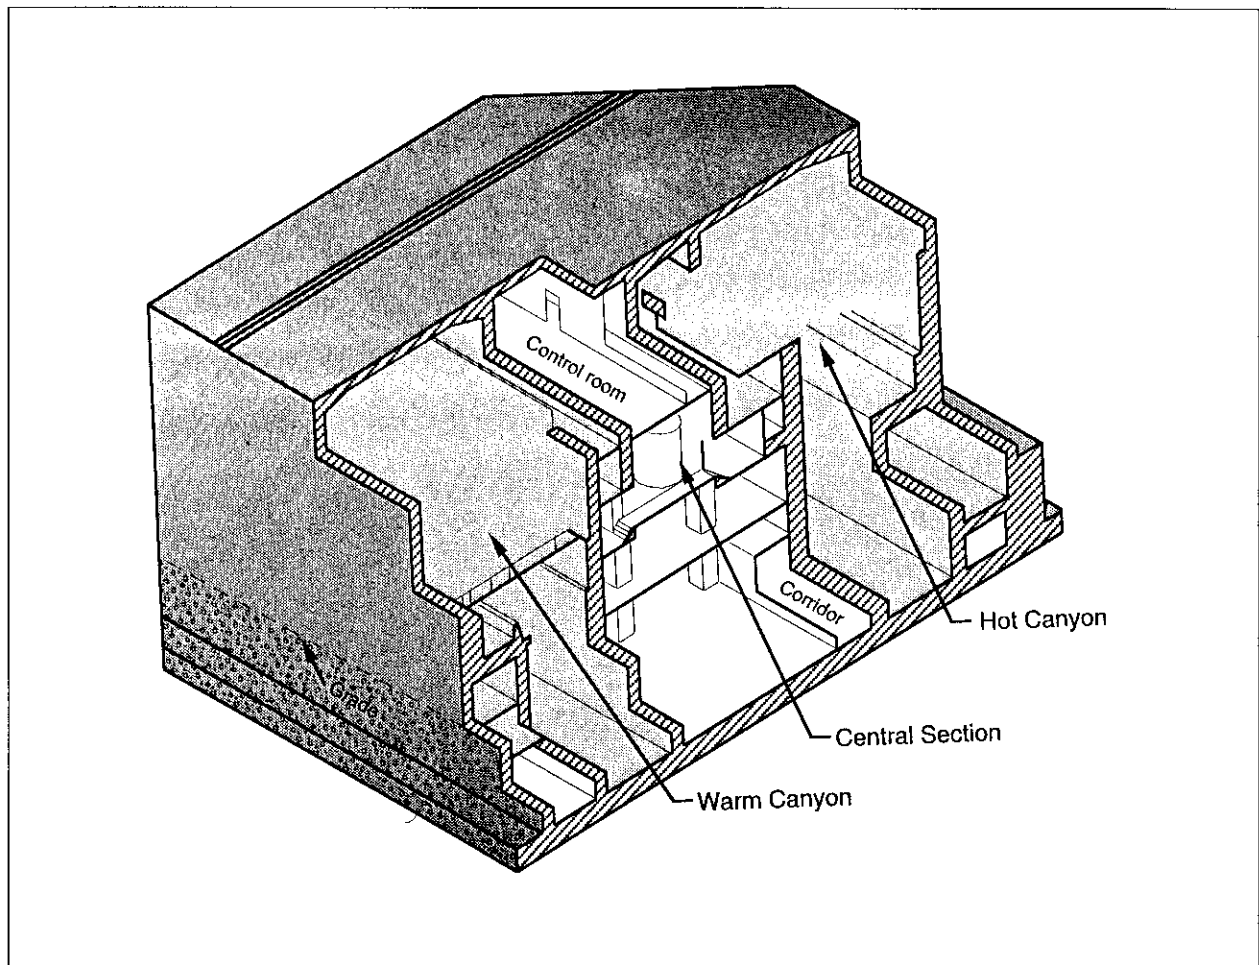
Layout of Chemical Separation Building Sections at Savannah River Site
